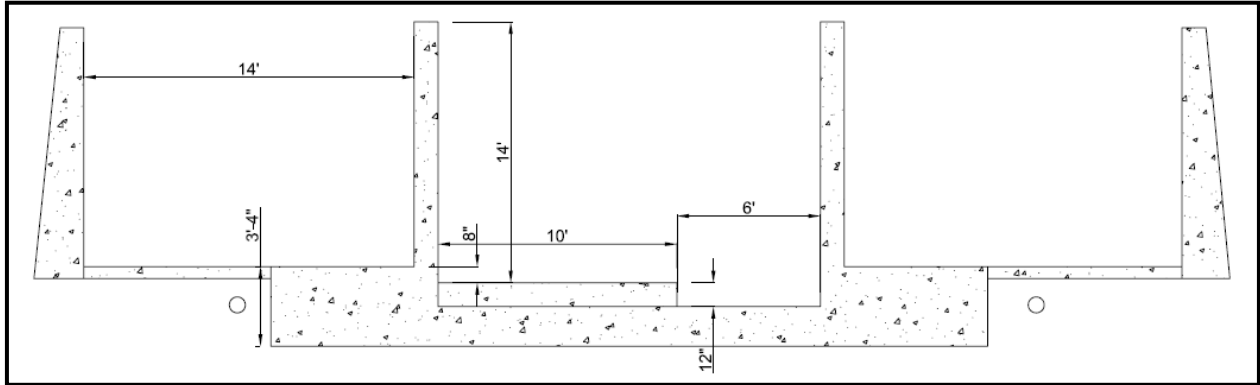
Reach Type 8 (Underground) Layout and Dimensions.
